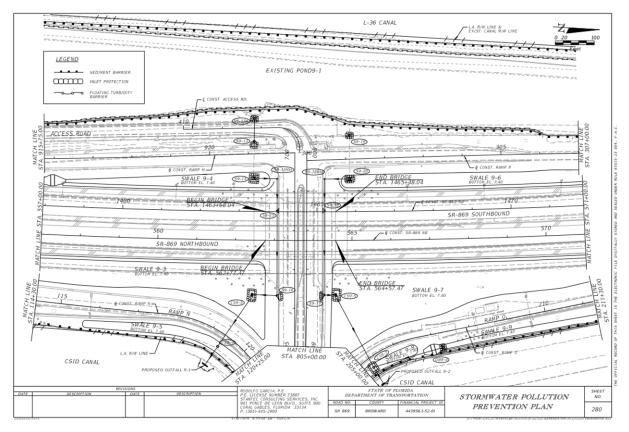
Example of a SWPPP Showing Sediment Barriers, Inlet Protection, and Floating Turbidity Barriers.
